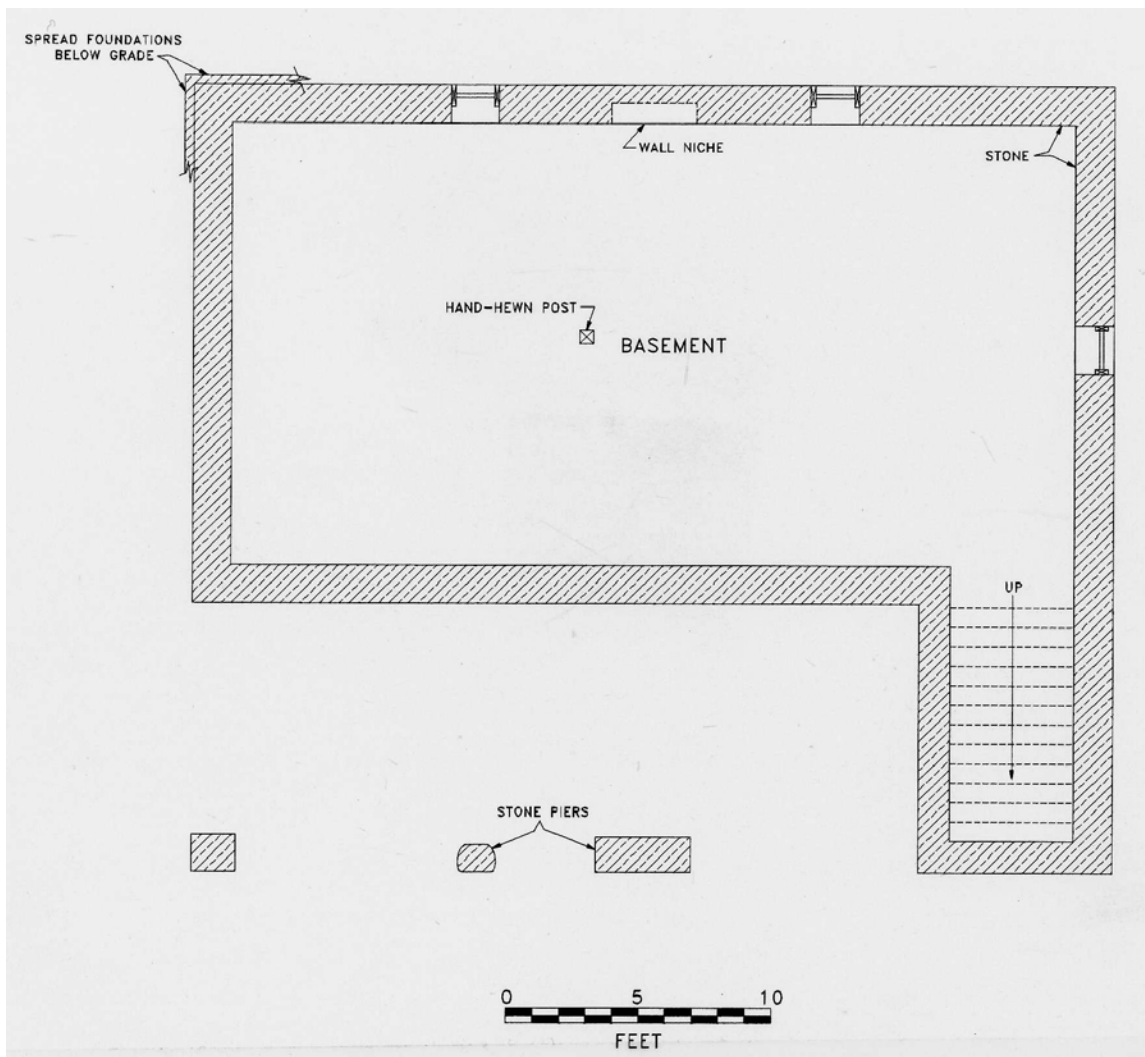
Basement and foundation plan of the Valentine House as originally constructed.
